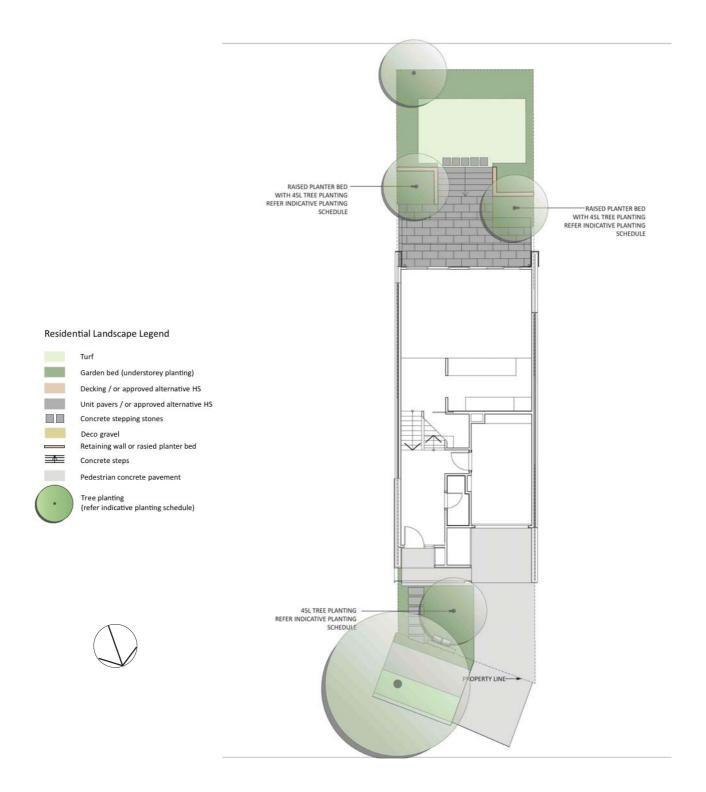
Typical House Type Three (Terrace) landscape concept plan
